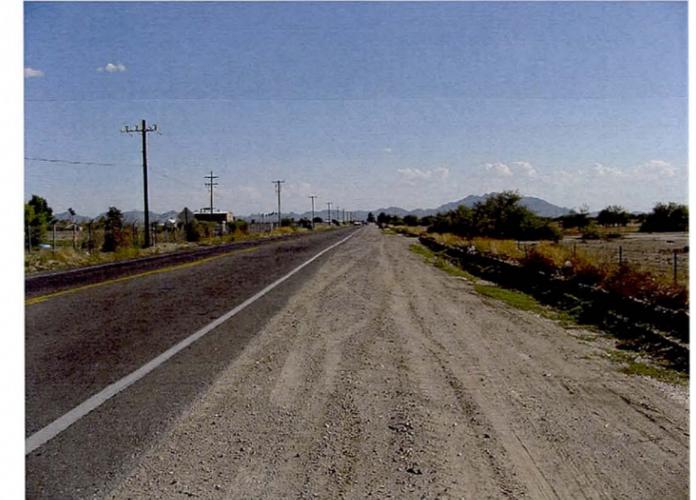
This view looks south along Power Road. The Rittenhouse Basin will be constructed to the right in this picture and the bottom will be approximately 15 feet below existing ground. The Town of Gilbert is considering constructing a golf course in the new basin bottom, and the club house and facilities are proposed to be located just off Power Road to the right in this picture.
